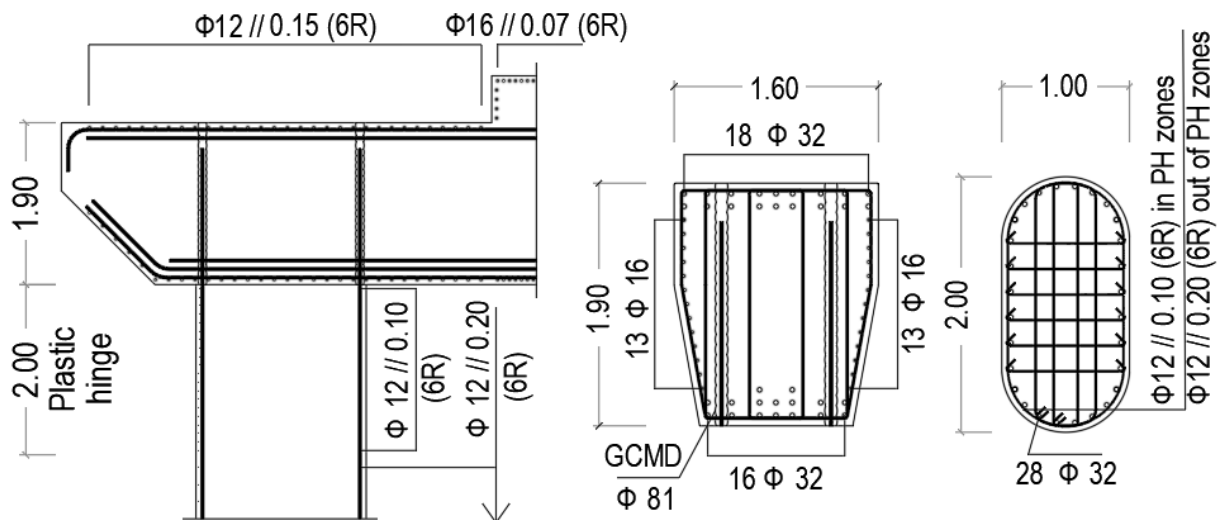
Column and cap-beam cross-sectional and reinforcement layout regarding scenario with $q=3.0$.
